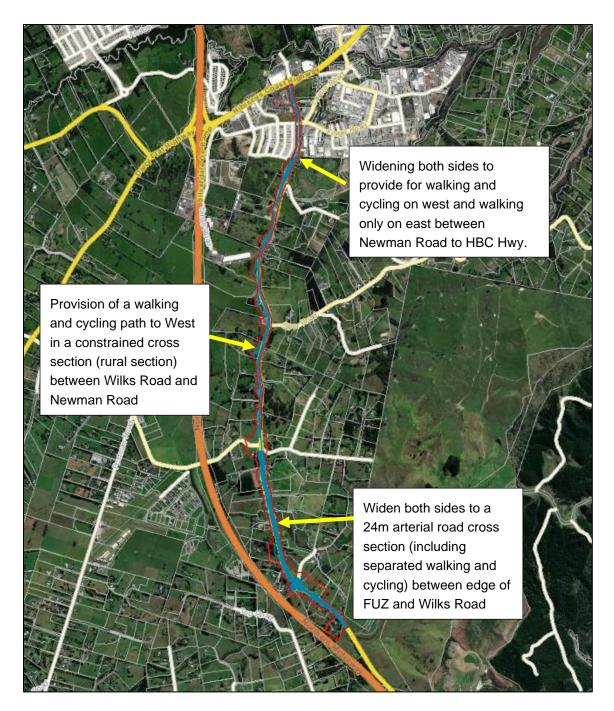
Preferred route for Upgrade to East Coast Road between Silverdale and Ö Mahurangi Penlink
